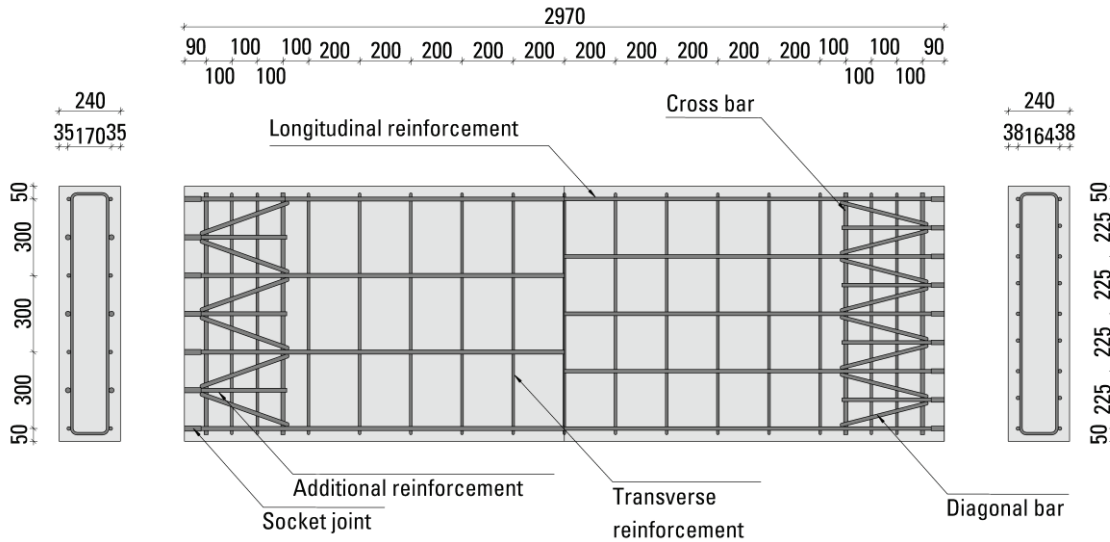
Specimen geometry and double-layer reinforcement layout for the specimens of test series 1
